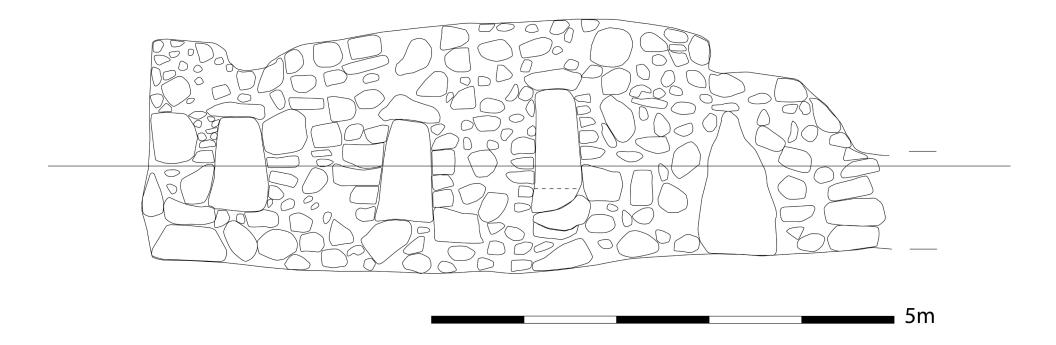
Inside elevation of the South wall of Building NS5, Kañaraqay
